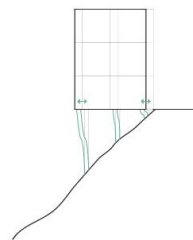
Unequal column length cause disproportionate stress to shortest column (Shock Safe Nepal group 1).
